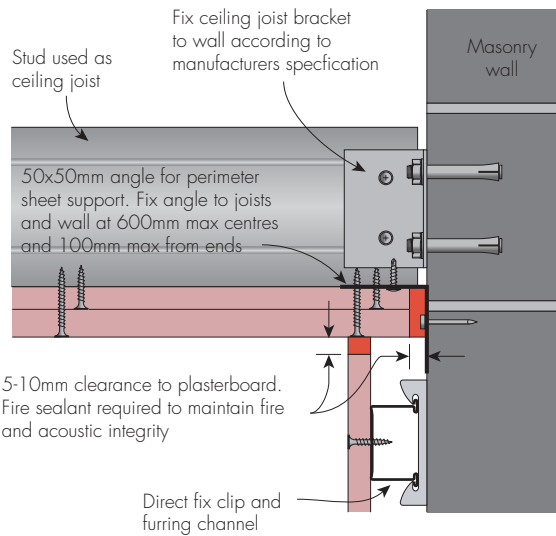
Non-Trafficable Ceiling to Masonry Wall
